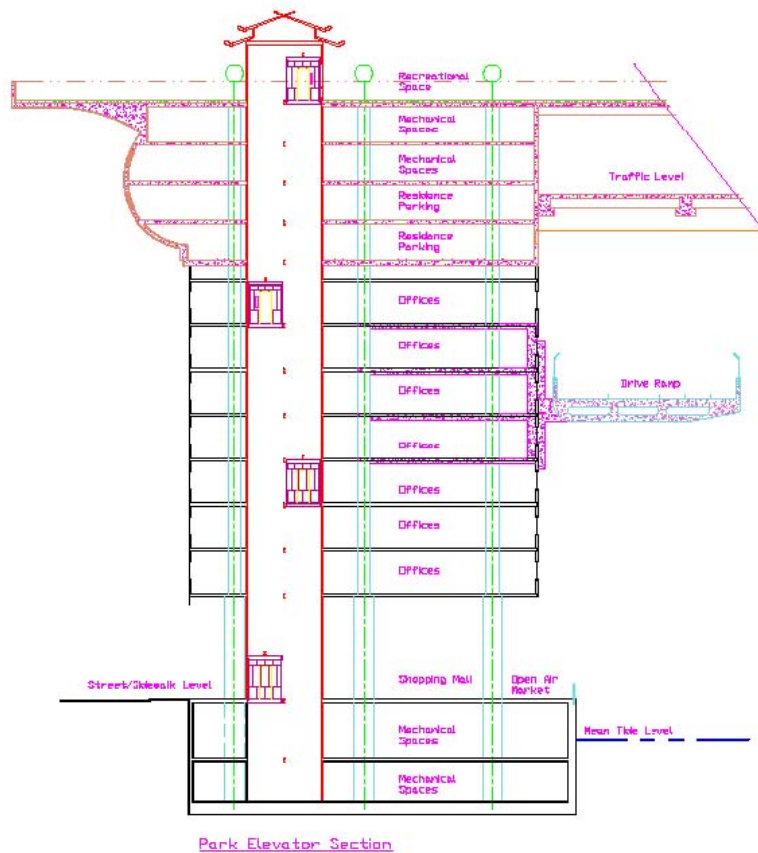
Office/park core section (Showing drive ramp to bridge)
